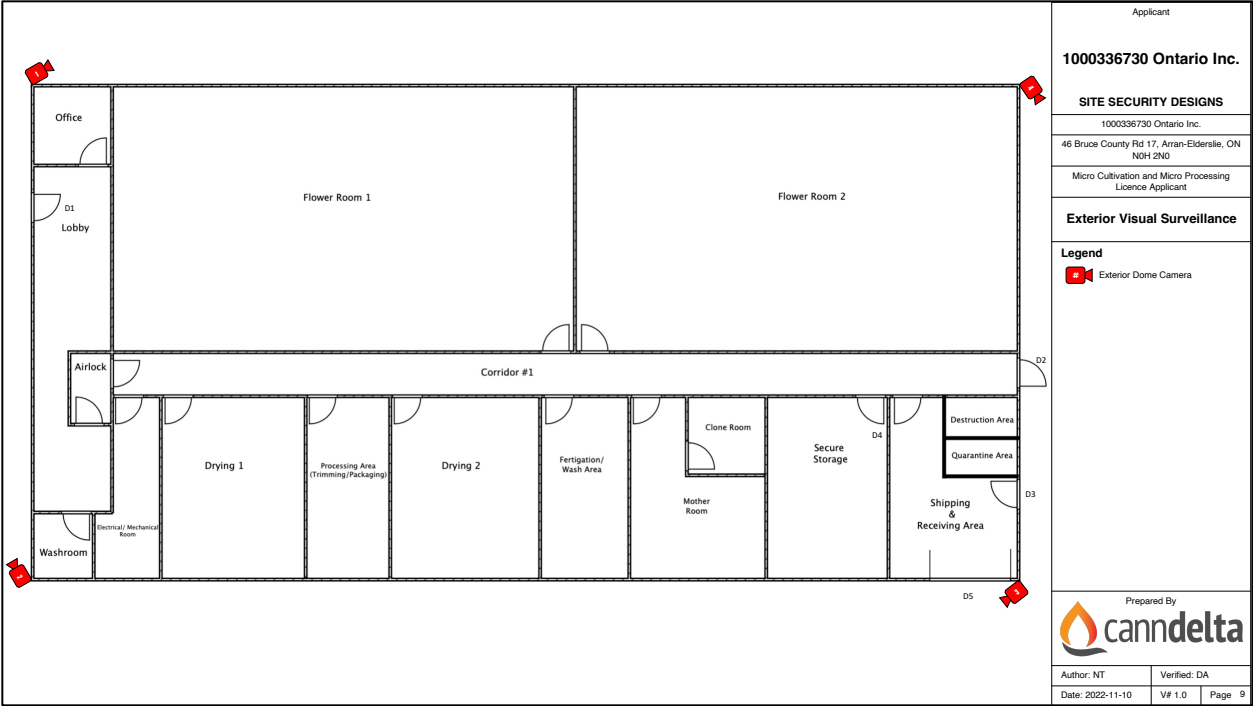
Exterior Visual Surveillance device layout at the proposed facility.
